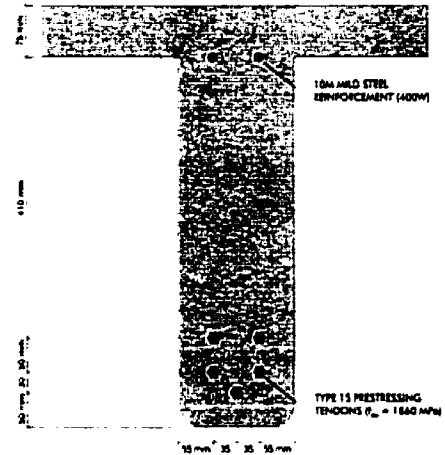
Configuration of the longitudinal reinforcement for Series B beams
